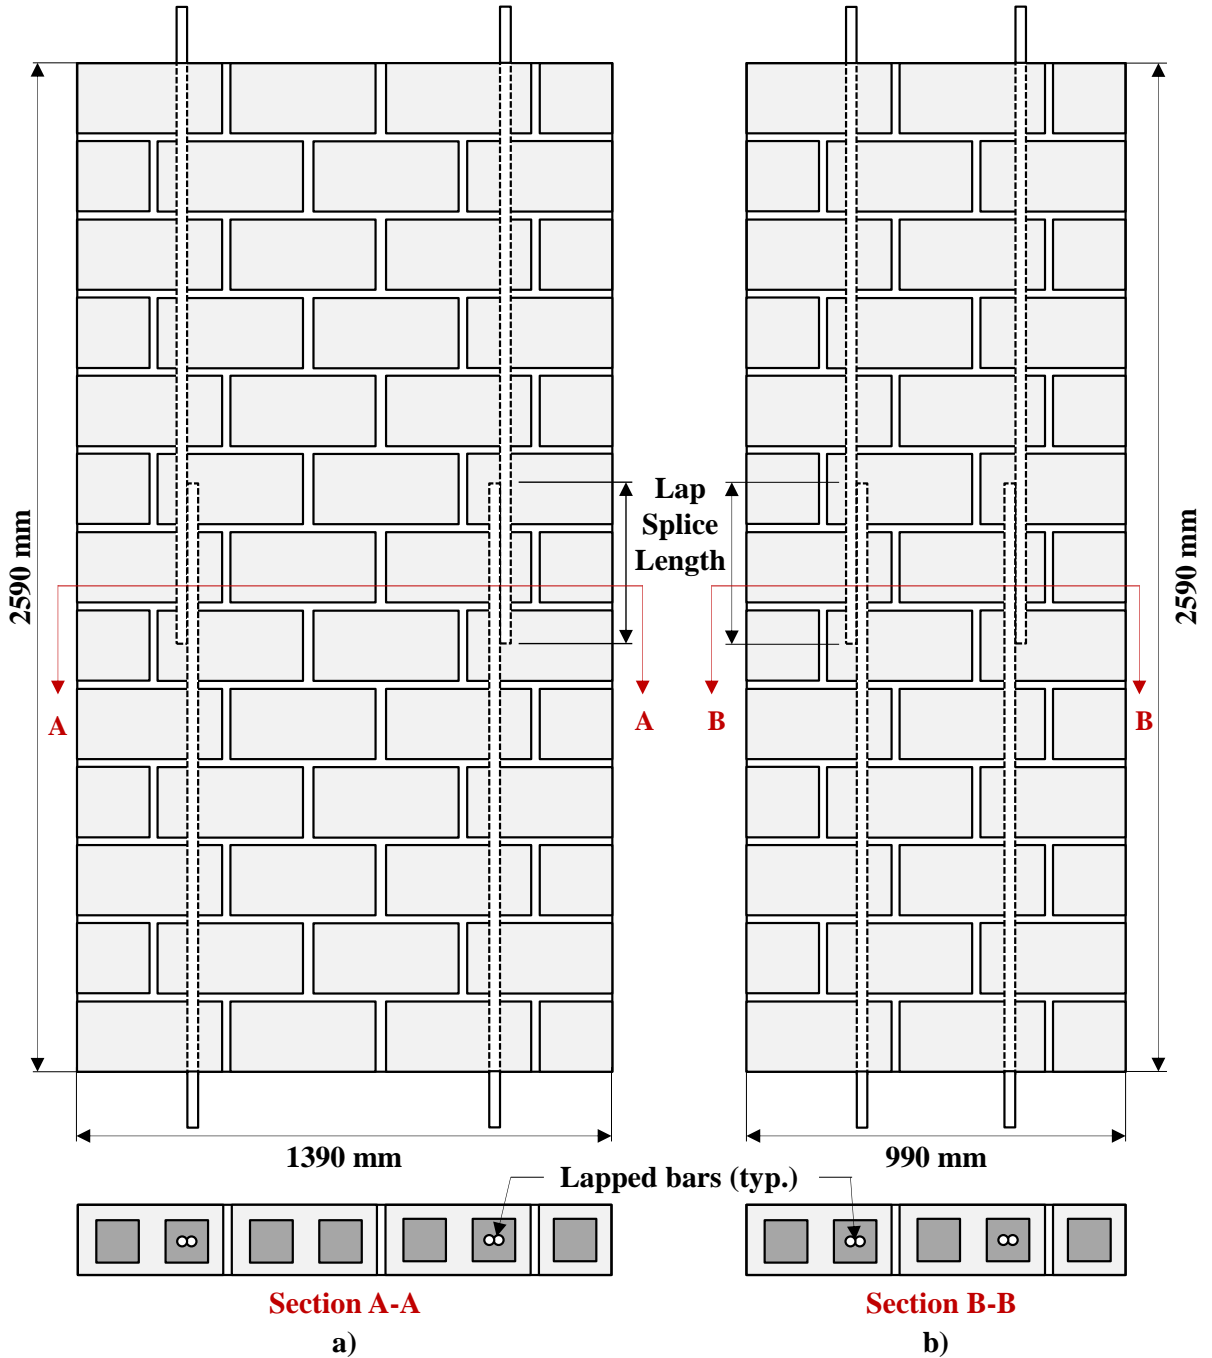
Wall splice specimens with spliced No. 20 reinforcement: a) 3.5 blocks wide, and b) 2.5 blocks wide
